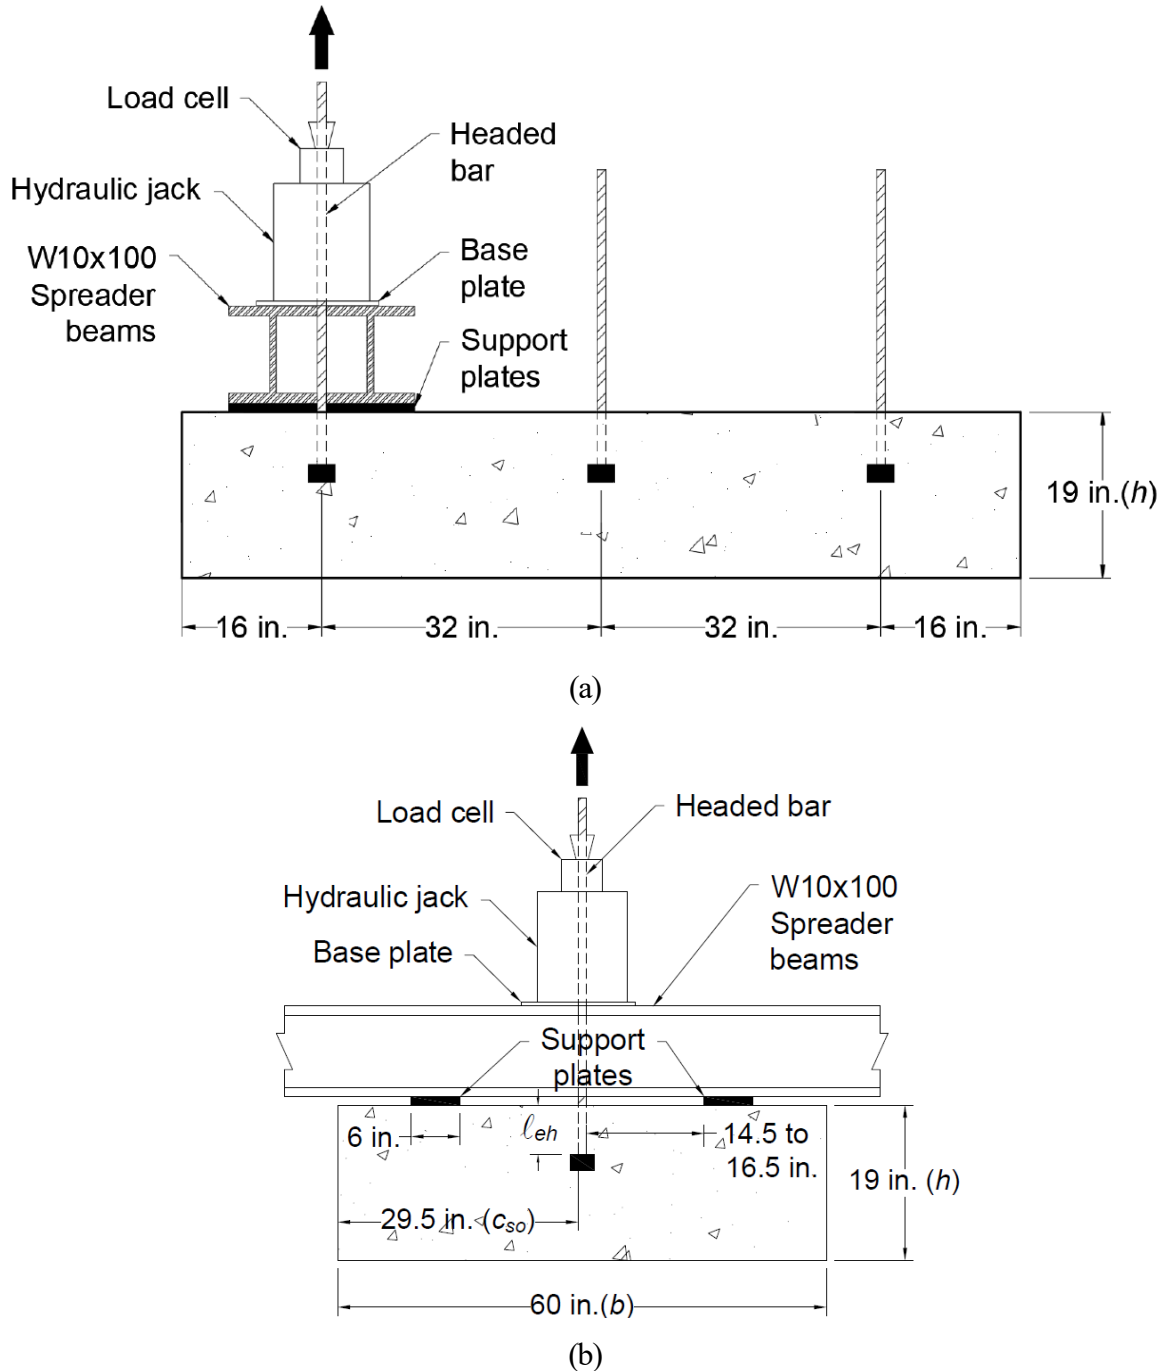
Test setup of the final group (a) front view, (b) side view (Ghimire et al. 2018)
